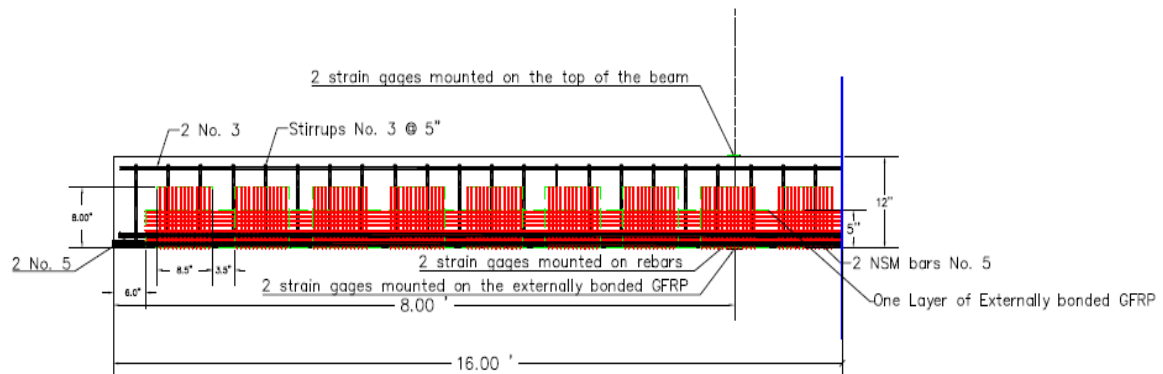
Reinforcement Details for Full Length NSM rebar Beam (Specimen R2)
